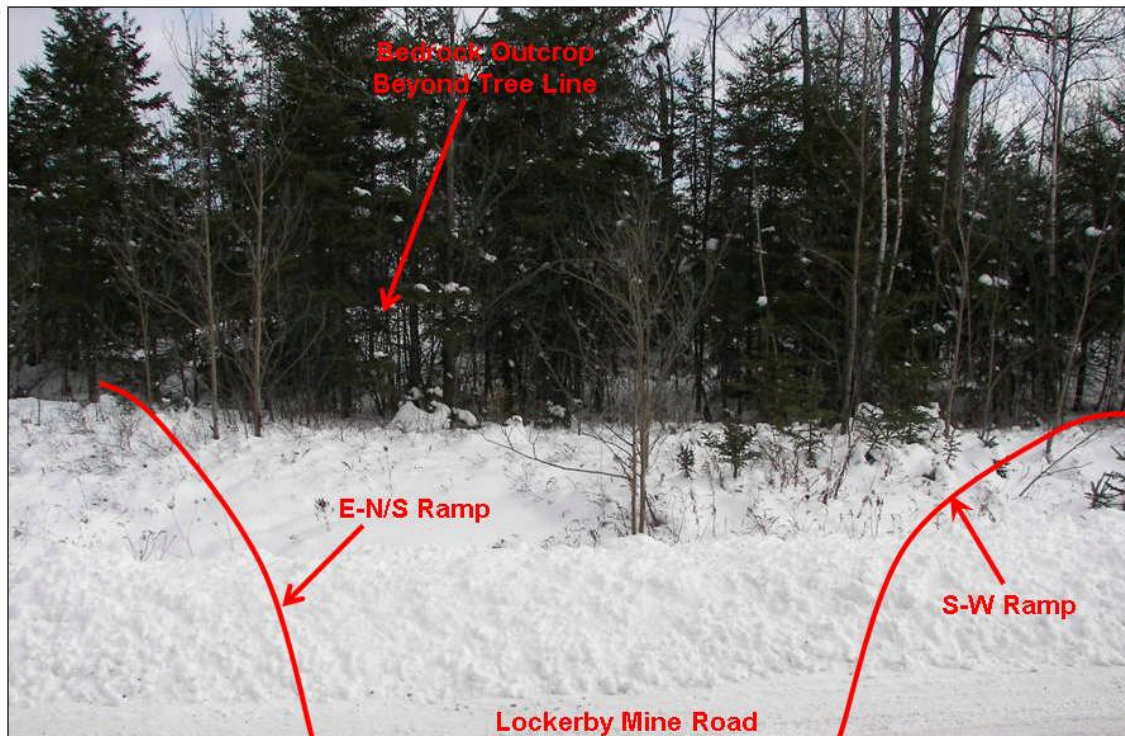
VIEW: Looking west from north shoulder of the Lockerby Mine Road about 900 m east of intersection with existing SMR3. Existing Lockerby Mine Road starts to swing to north to intersect realigned SMR3. Shallow bedrock in bush areas. Swamp area visible beyond tree line. (Dec. 6, 2007)
